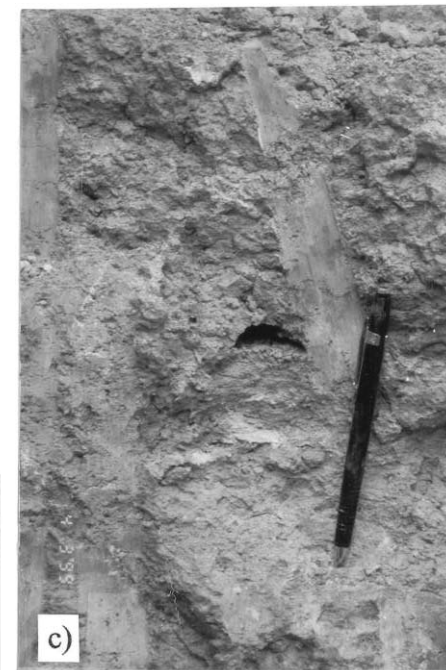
Close-up Views of Voids/Soil Pipes Exposed in Trial Trench TT1
